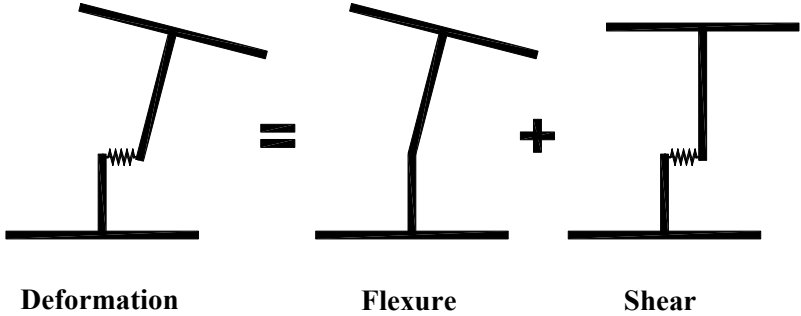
Schematic deformation decoupling of a RC wall element in MVLEM [19]
